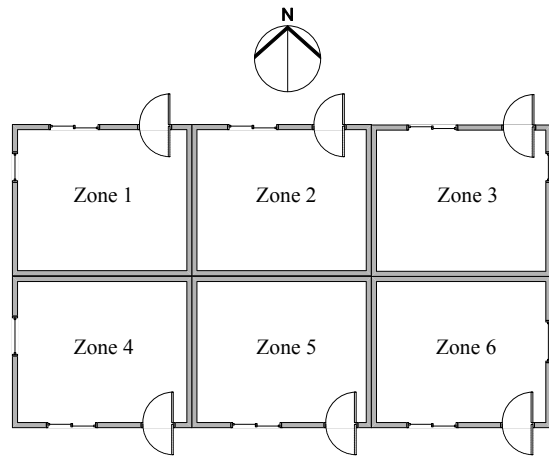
Floor plan of office building (1st and 2nd floor are identical).
